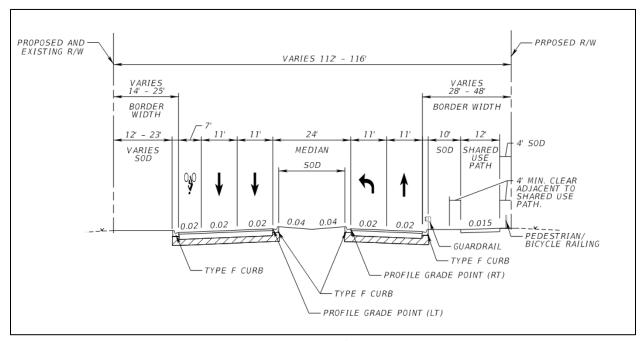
Proposed Typical Section for Aviation Blvd (west approach)
